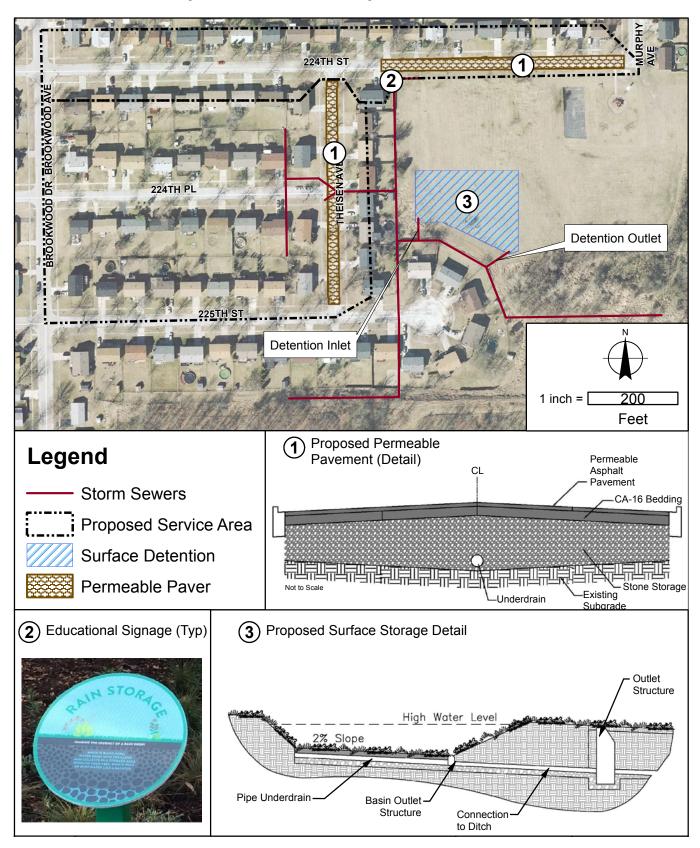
Stormwater Improvements Parkland Concept Plan
